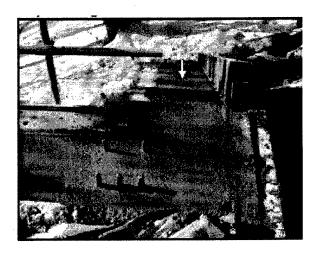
The top form was removed (arrow) from the abutment 15 minutes after the concrete was placed to allow finishing.
